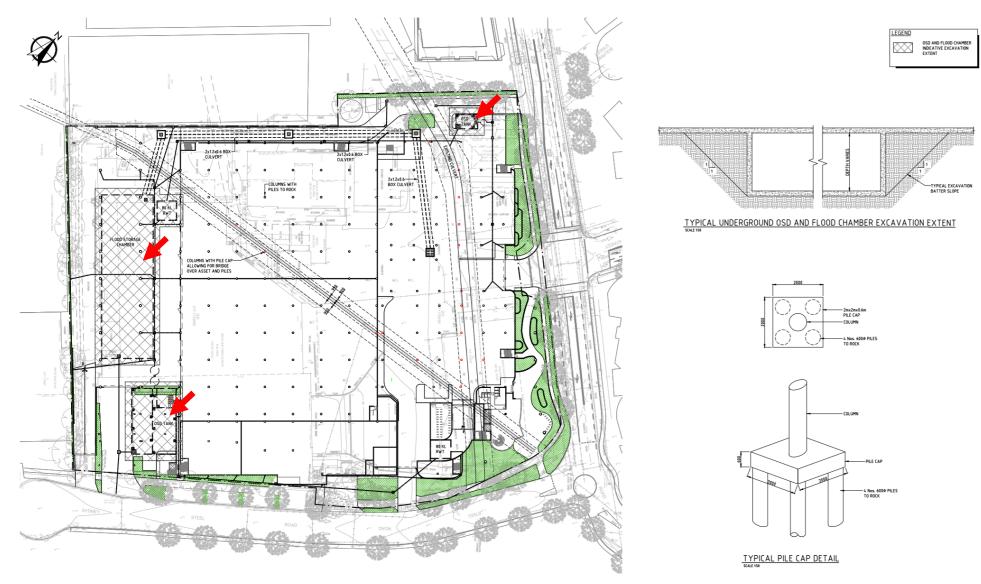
Excavation extent plan. Note the proposed bulk excavation areas marked by the red arrows. *Source: Richmond* + *Ross, August 2020
